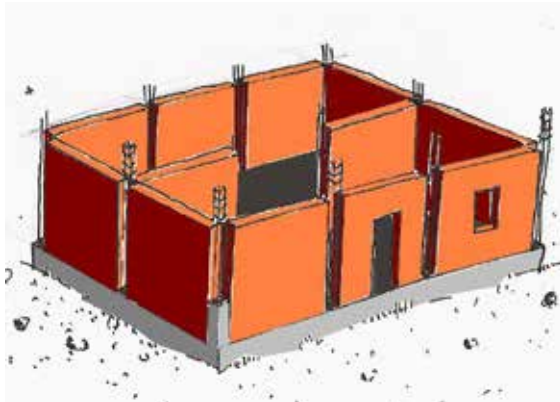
Confined masonry building under construction (Source: T. Schacher).
